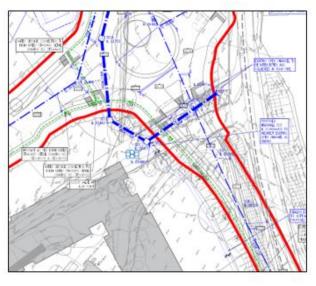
Extract of Site Services Plan (sheet 7) showing proposed piped drain
